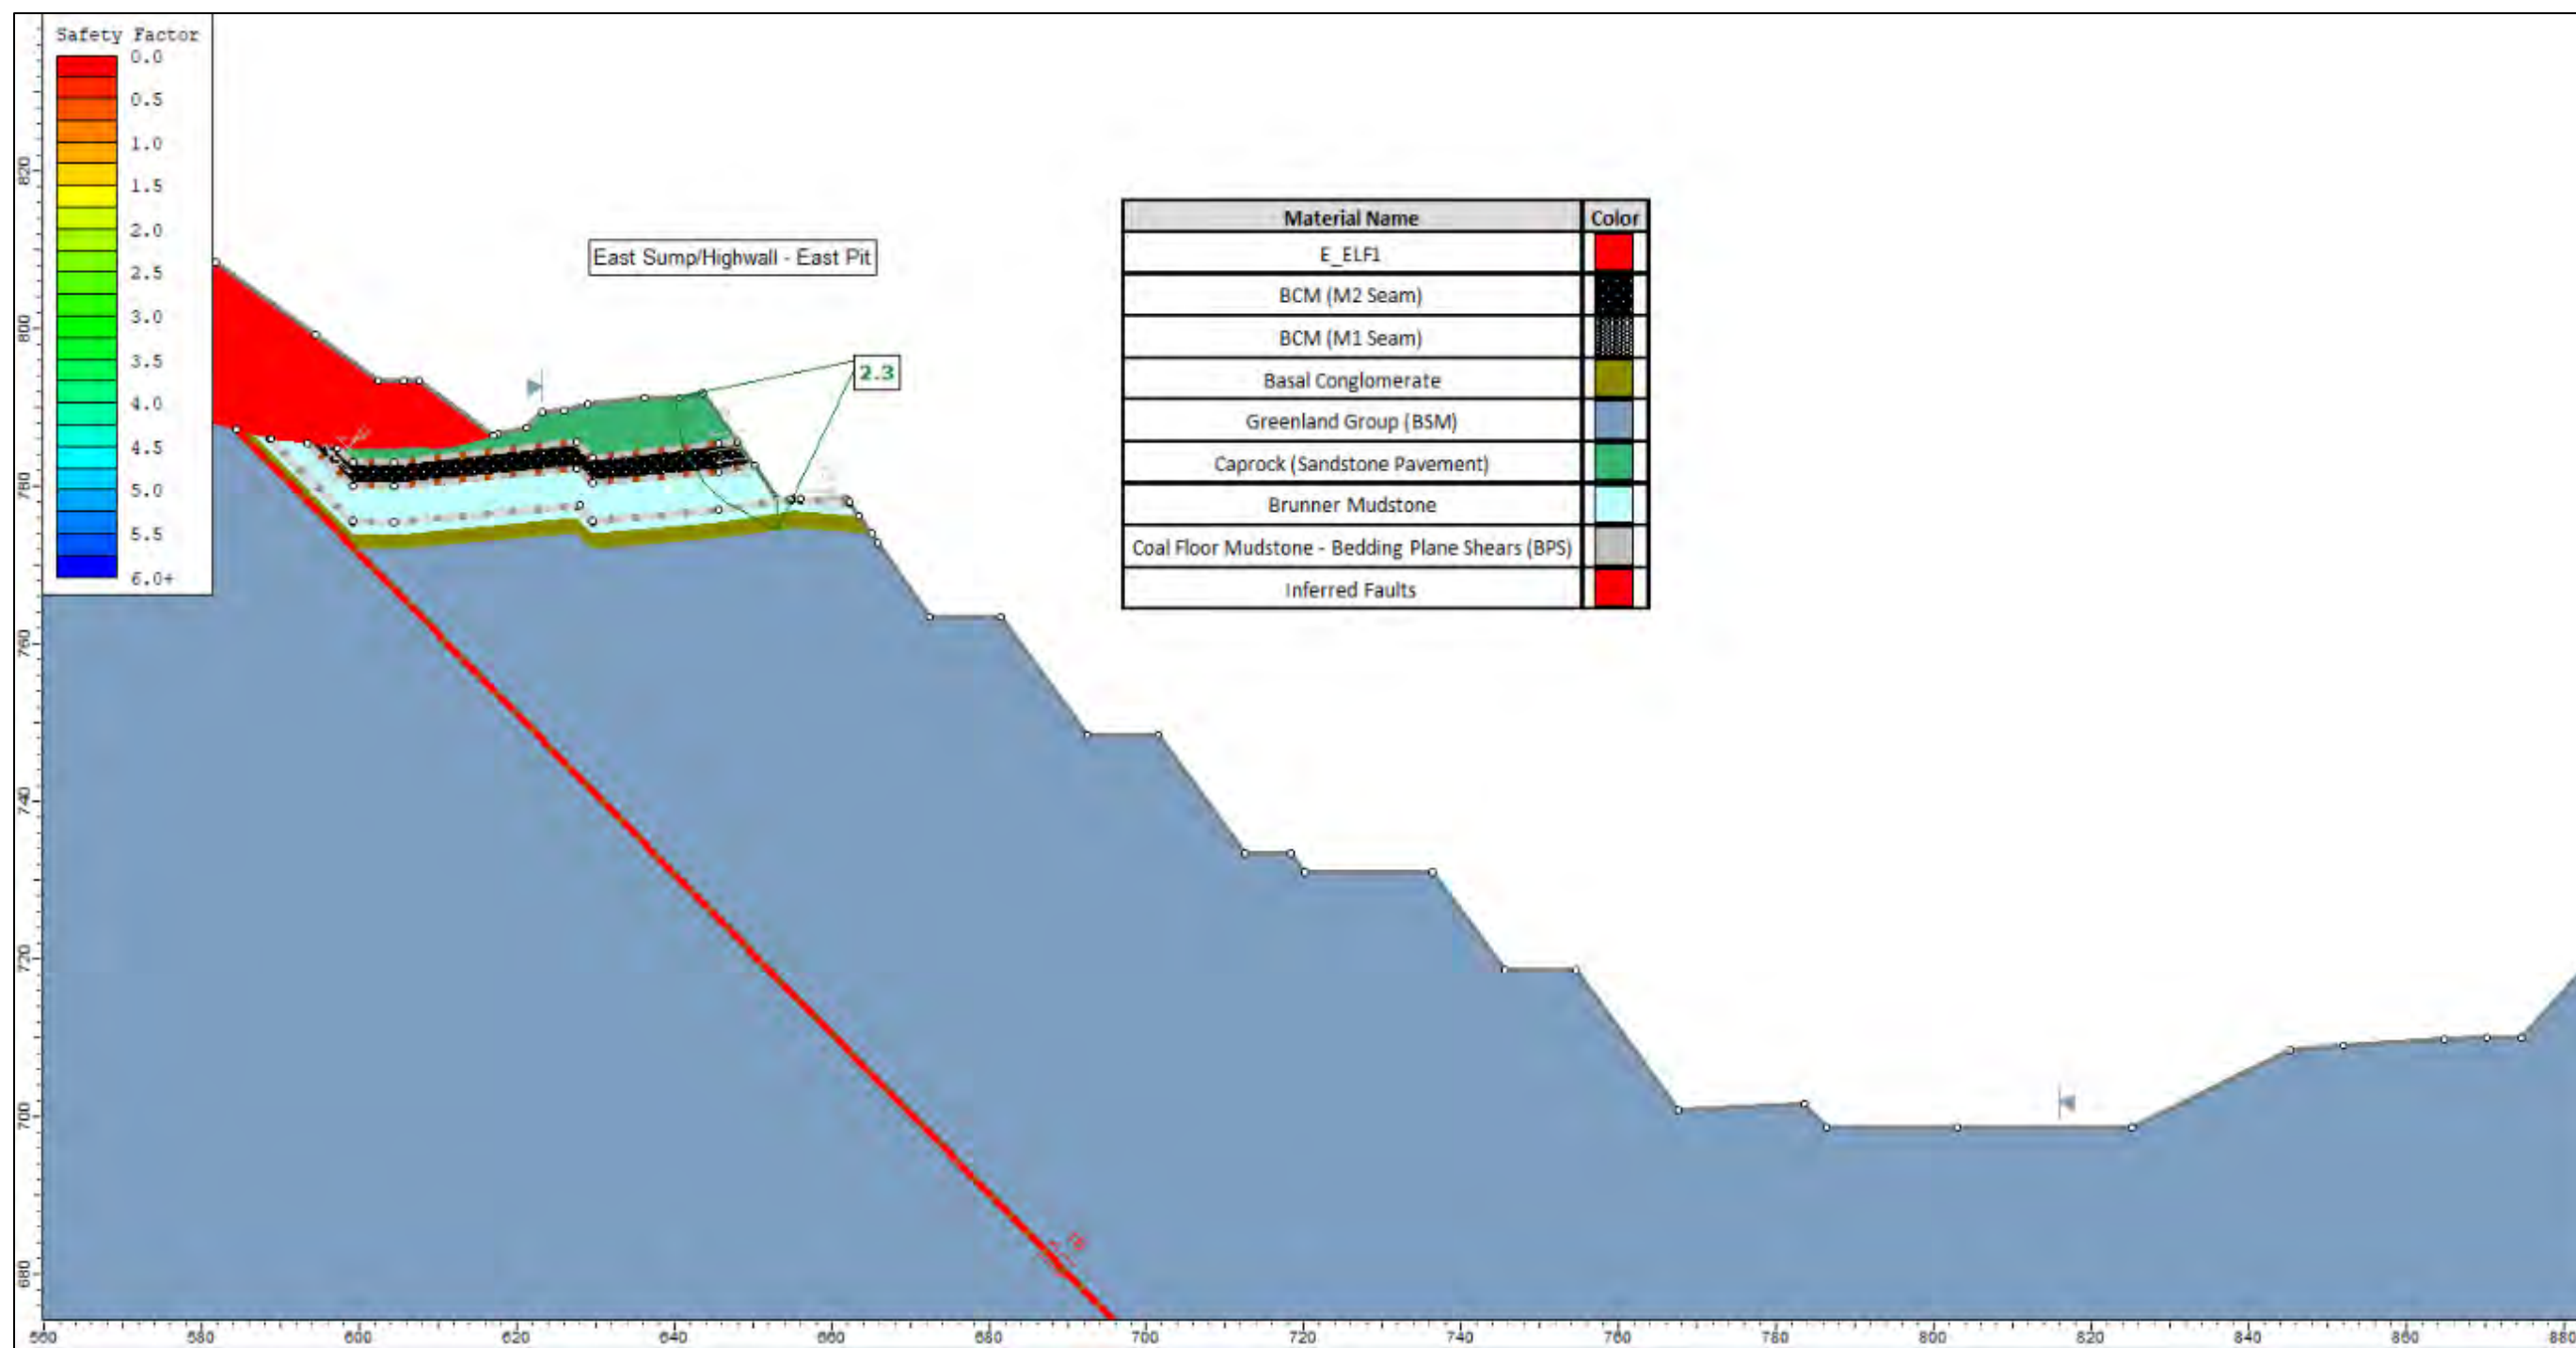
East Sump/Highwall - East Pit Section 103 –Static Conditions.
